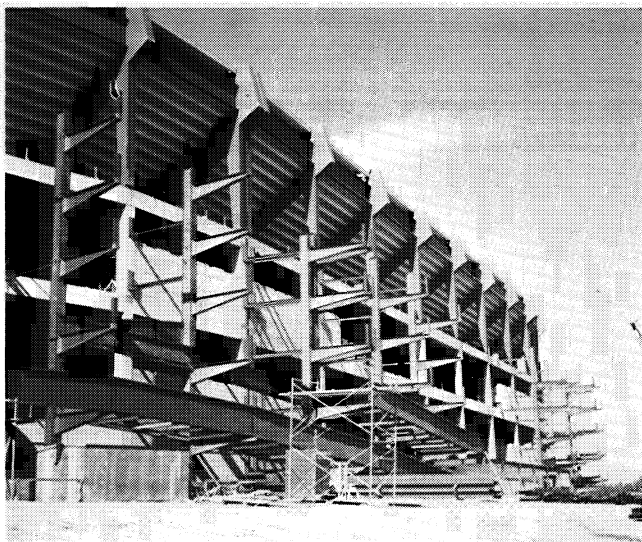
Over 700 butt welds in this cantilevered construction of Angel's Stadium were inspected with ultrasound. Weld integrity was assured in joints that would have been difficult to inspect by other methods
